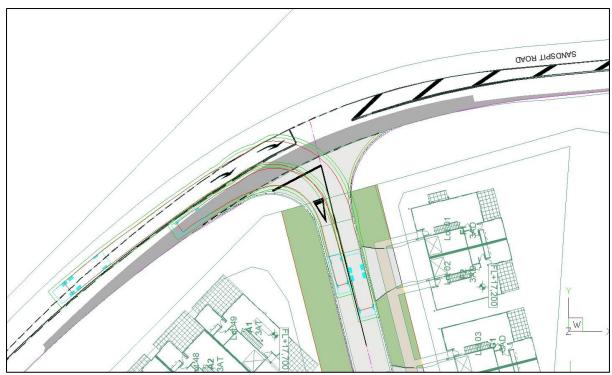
Sandspit Road Intersection - 10.3 metre Truck (Right In) & 6.3 metre Van (Left Out)
